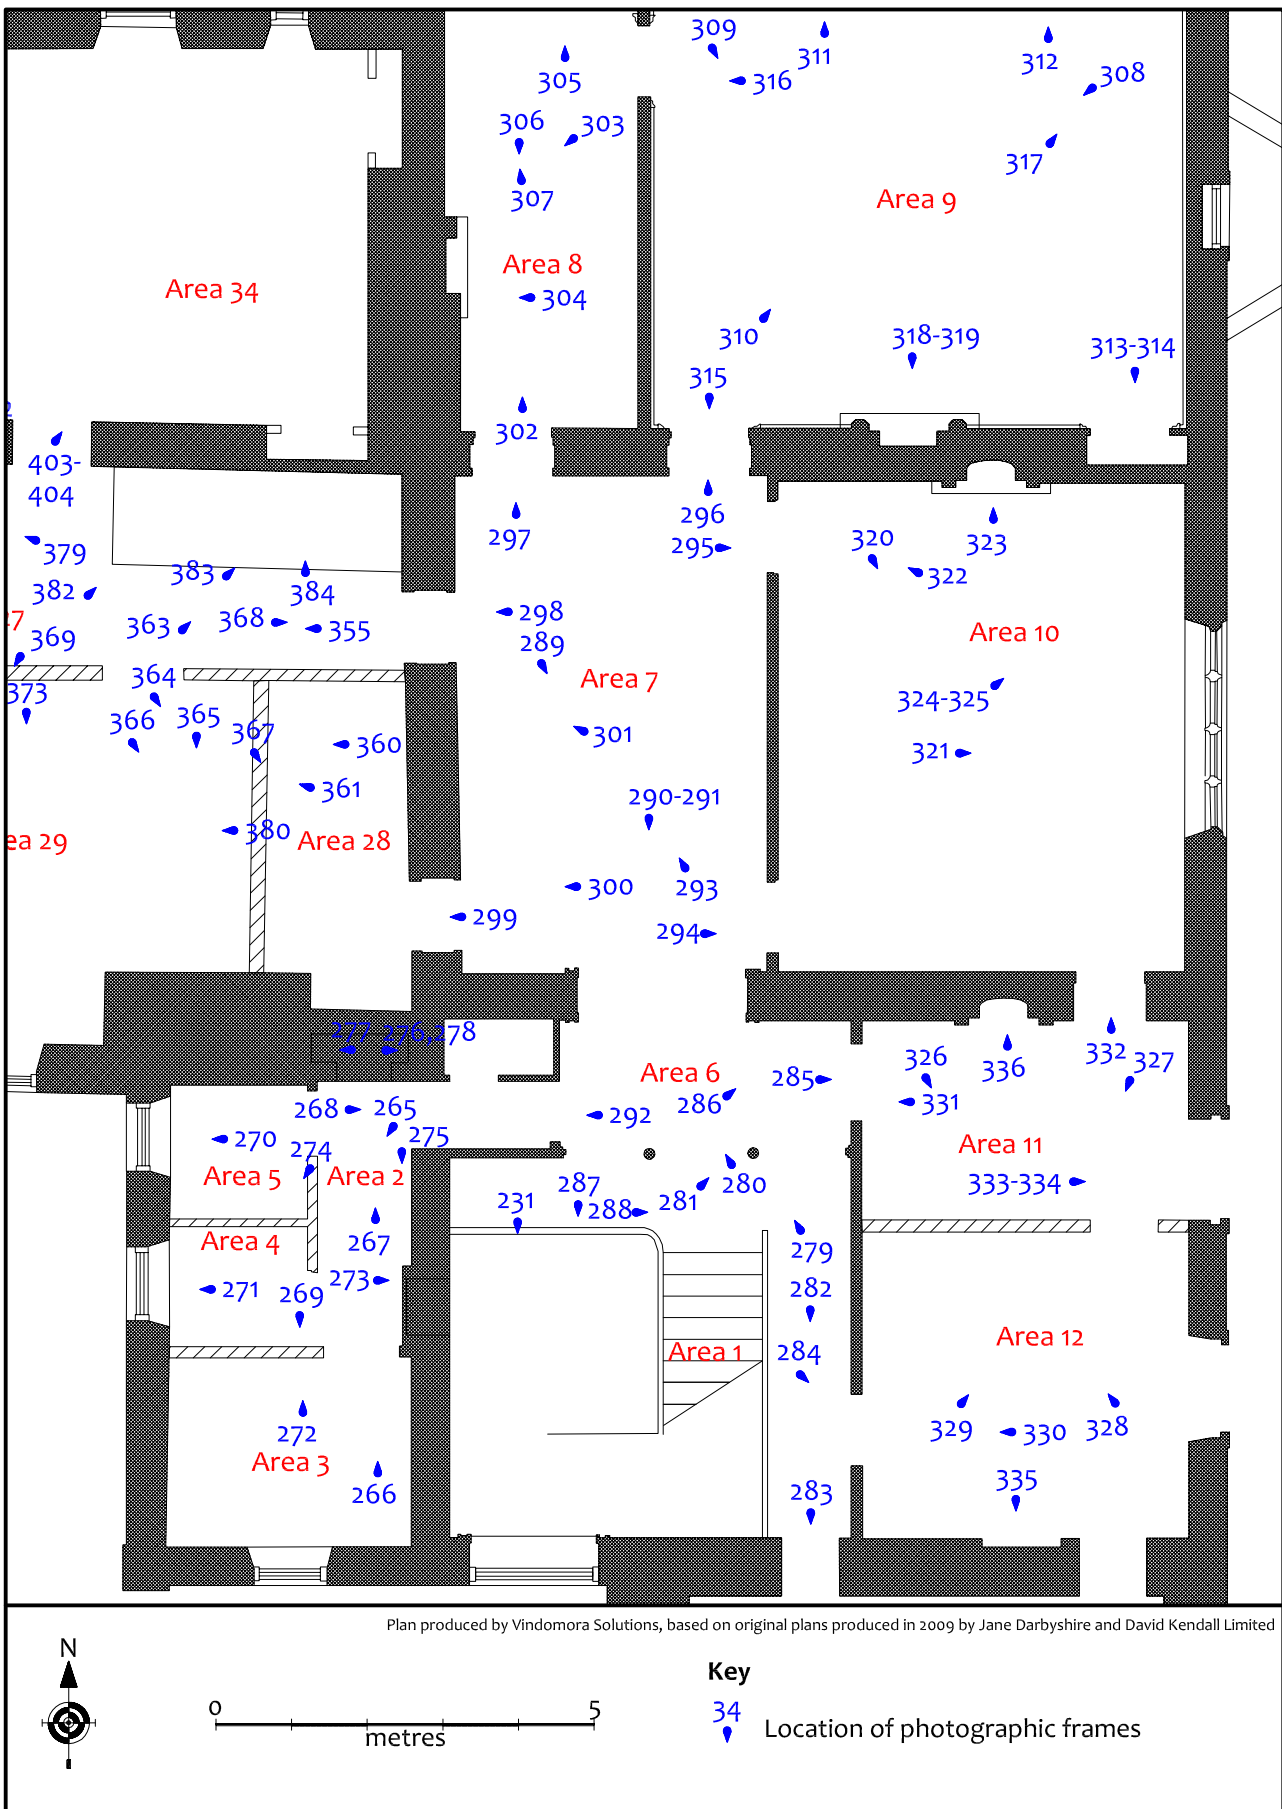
First floor plan showing location of photographic frames. Areas 1-12, 28
